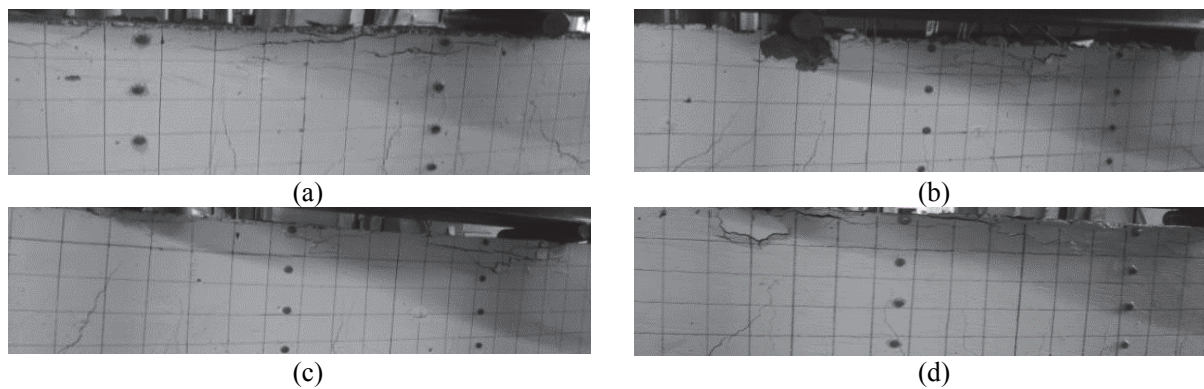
Failure pattern of BFRP reinforced concrete beams (a) SL-0; (b) SL-10; (c) SL-20; (d) SL-30
